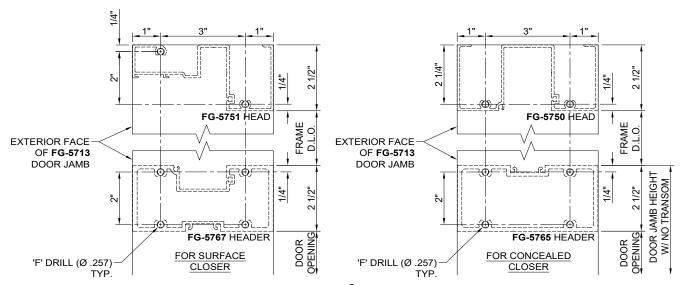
Fabrication for FG-5750 StormMax® Framing at Transom Head and Door Head
